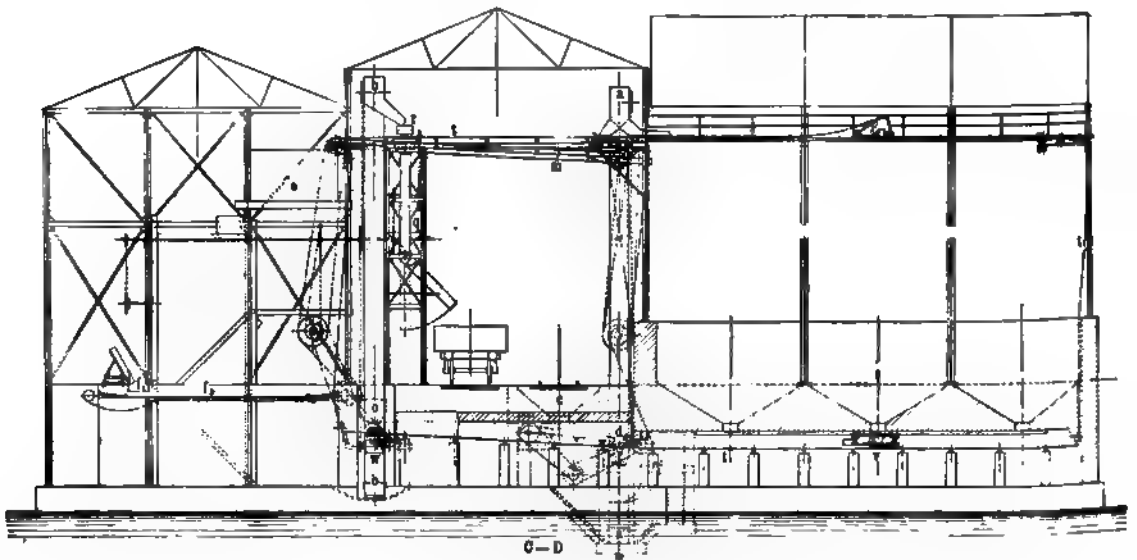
Elevation of Model Coal-handling Plant for use in Gas-works.
